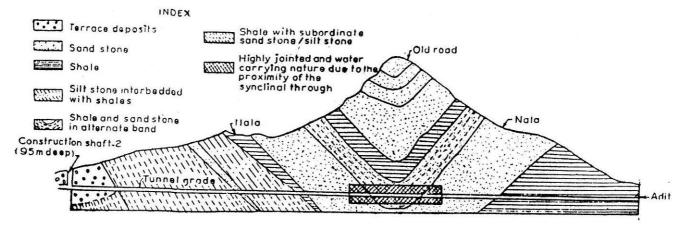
Typical Geological Section Along Tunnel Alignement (Loktak H.E. Project)
